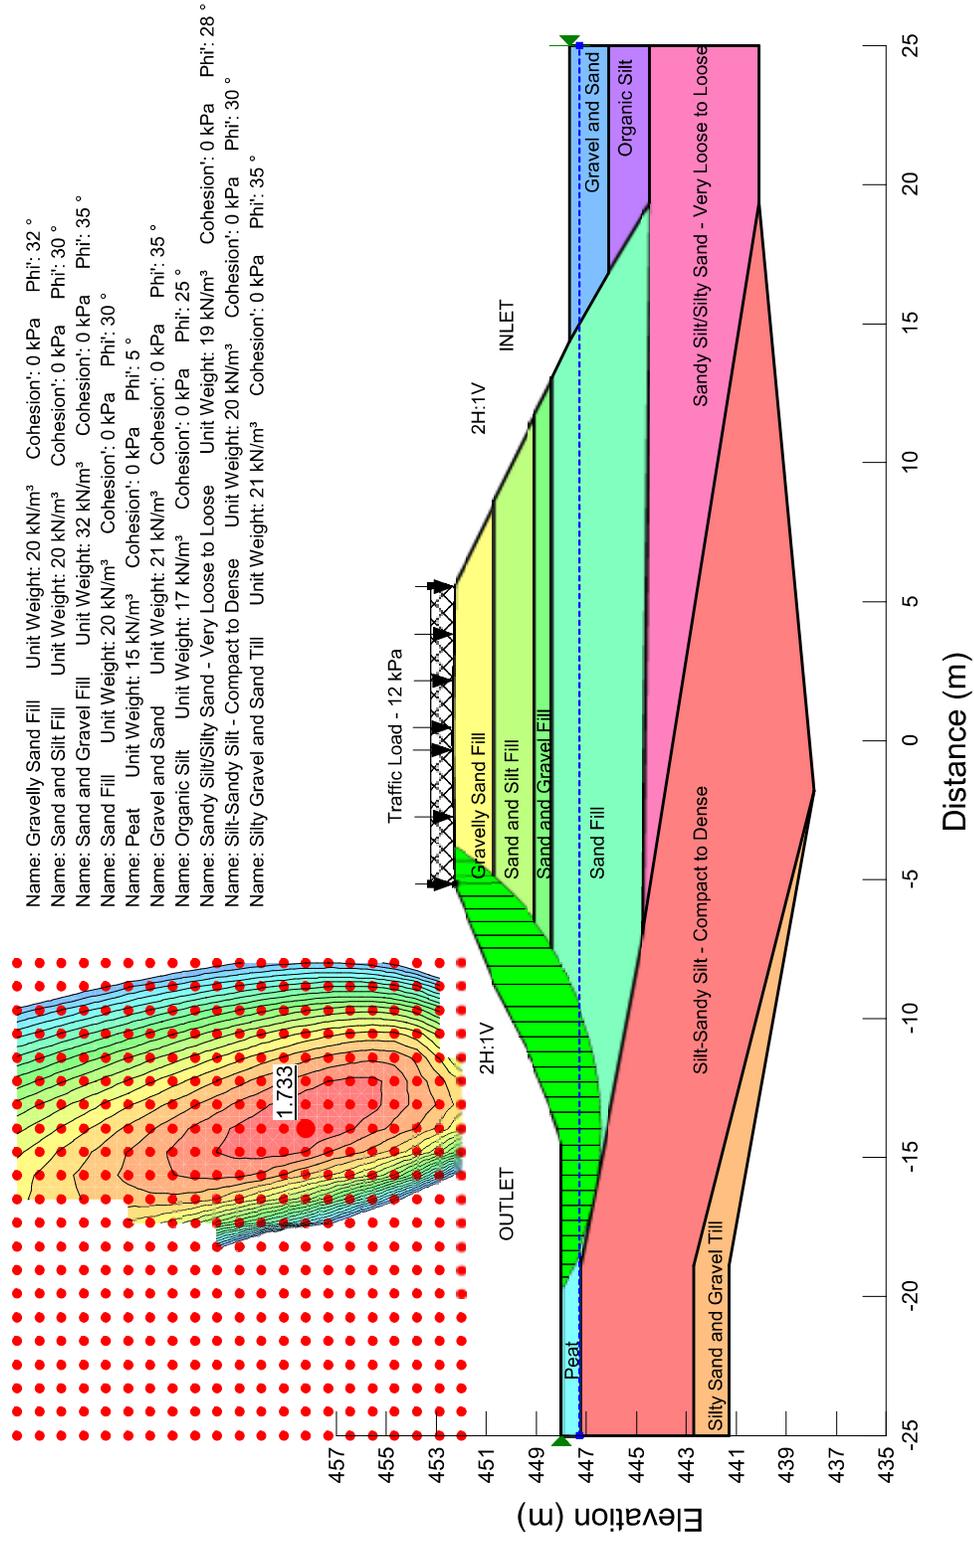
Proposed Embankment Stability - Inlet Side
